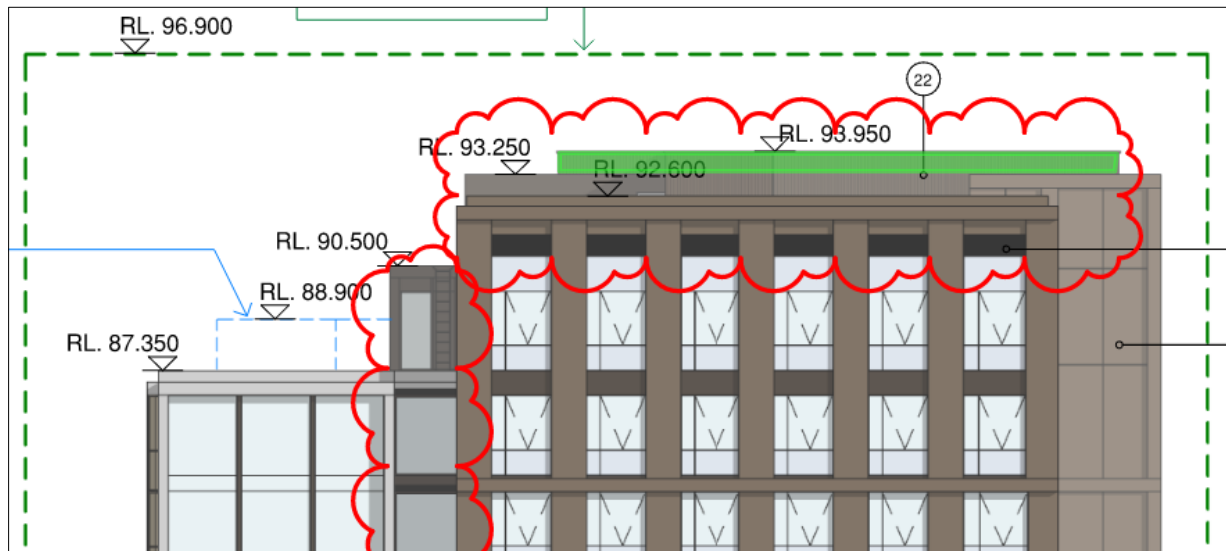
Proposed Amended Plan: South Elevation: DWG142 Rev I (additional height in green)
